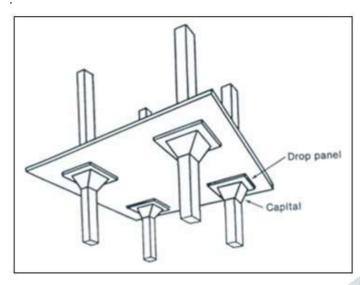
Flat slab with drop and column head(https://www.google.co.in)
